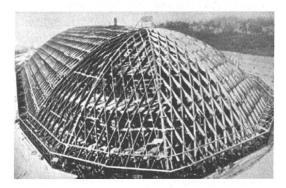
St. Louis Arena under Construction System Zollinger 1927 (Bayerische Hallenbau GmbH 1929, 28)
